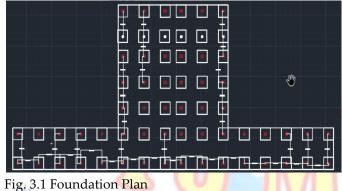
depicts the schematic columnar and footing layout of the elevated station on ground following the columnar grid of 6600 and 7500 mm to create the extended bay which will be utilized for the station.
